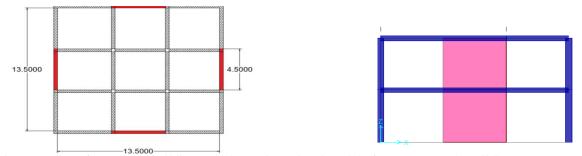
Plan Of G+1 squat building and Three Dimensional model of G+1 Squat wall Building
